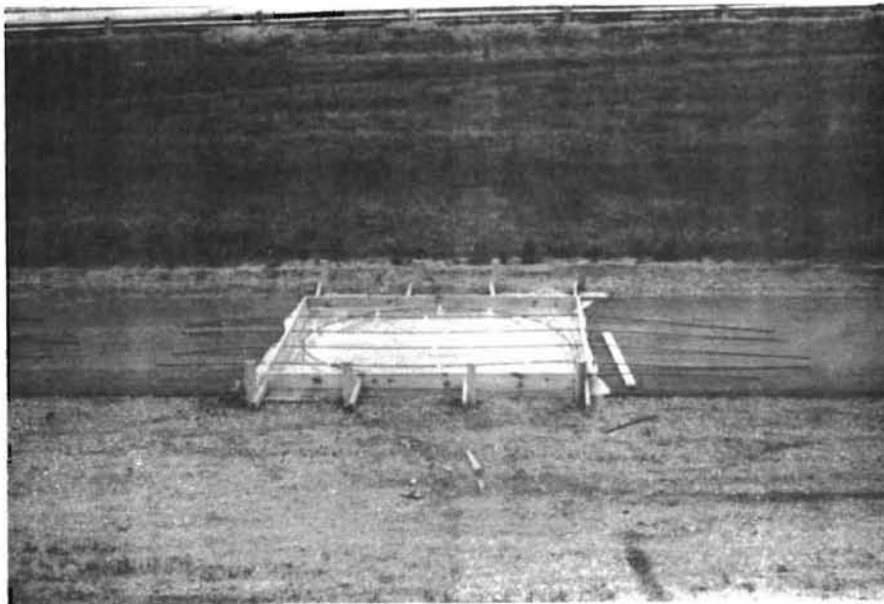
Layout of Test Slab No. 3 before casting the concrete.
